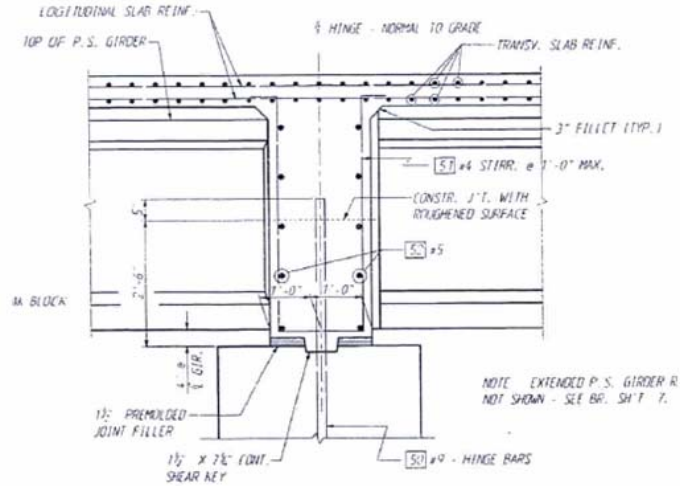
Bridge 405 Hinge Elevation (between crossbeam and deck)
